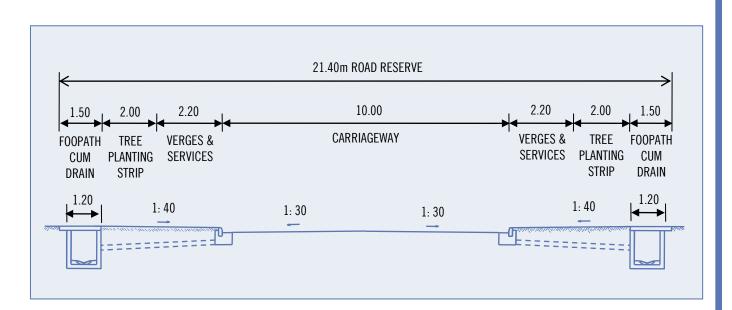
Undivided Two-Way Roads (2 Lanes)
